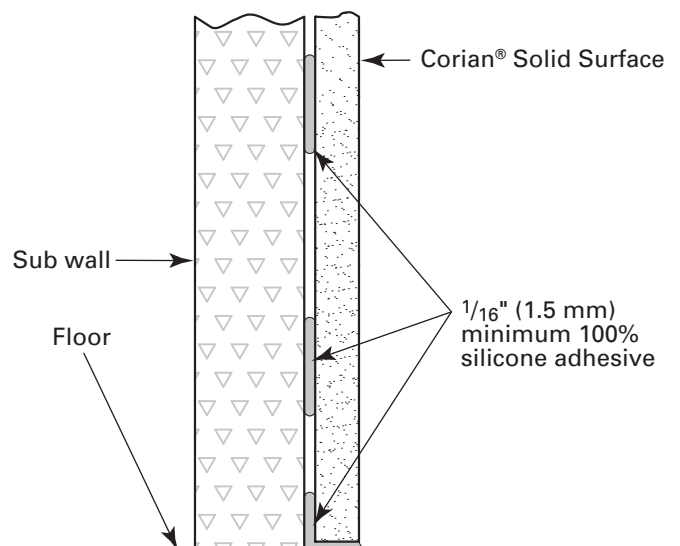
WALL BASE DETAIL WITH TRIM
